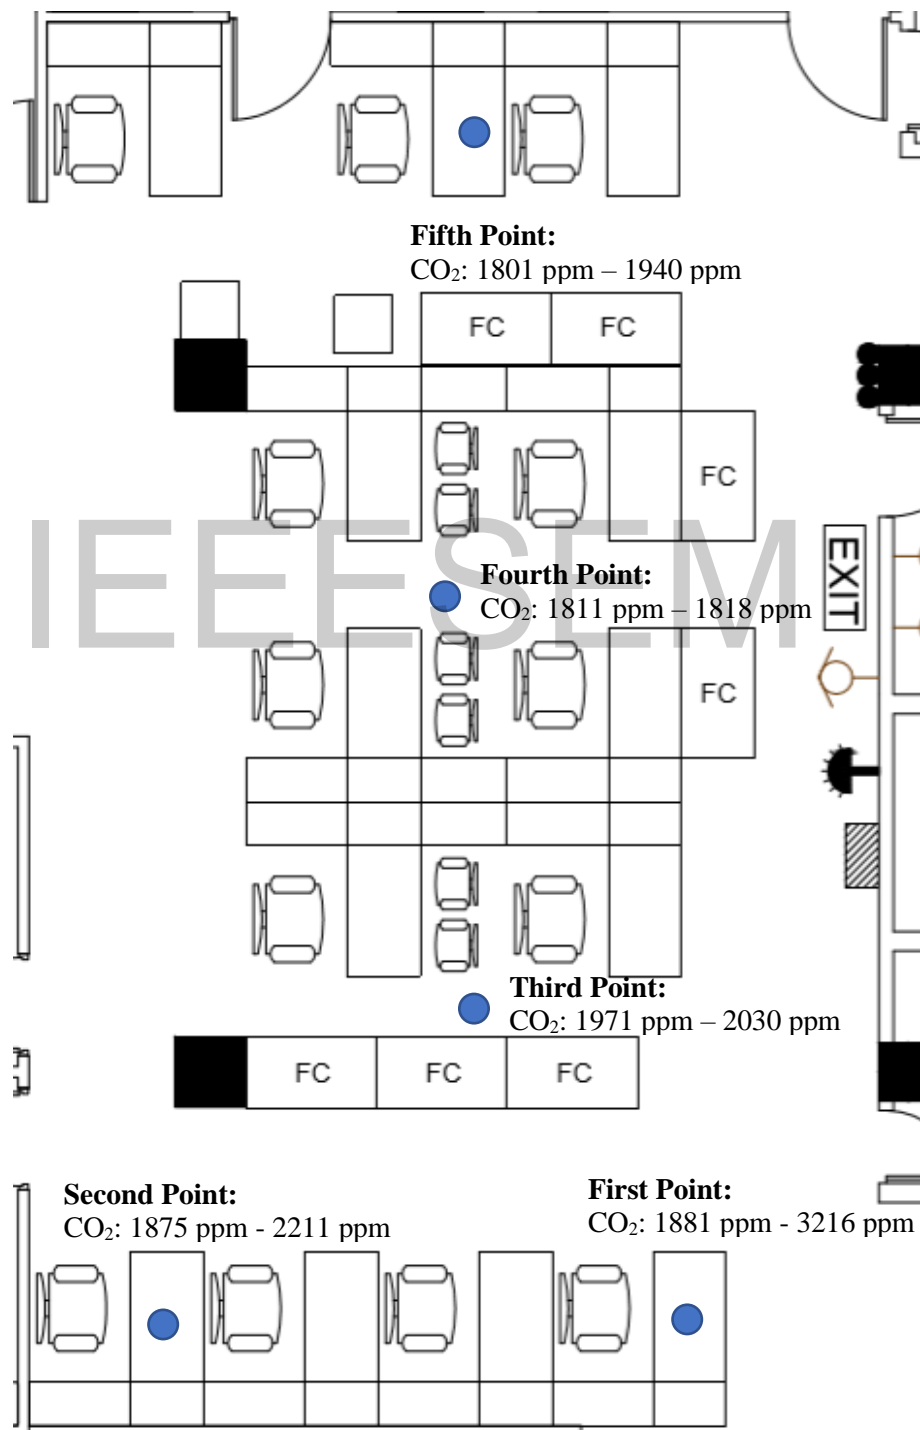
Working Space 1 in the Third Floor Plan (SNGPL)
